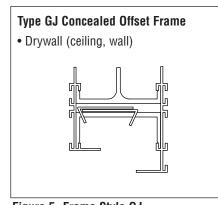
Frame Style GJ. Frame border styles G and J - combine to fit hard ceiling applications in perimeter applications or where the ceiling meets a wall or ceiling height varies.
